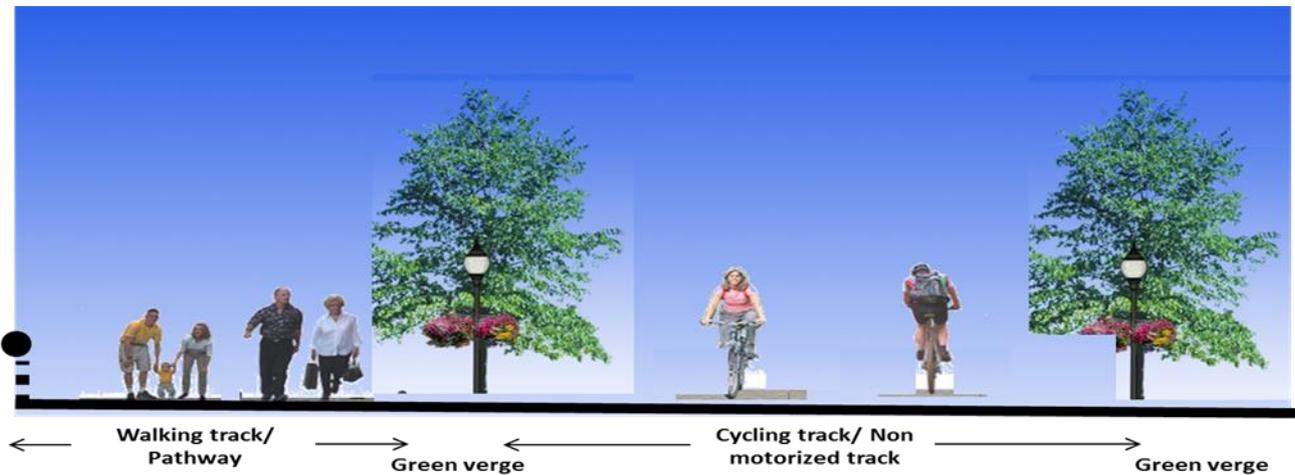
Typical Road section of Bandh Road along Budhabalanga river
